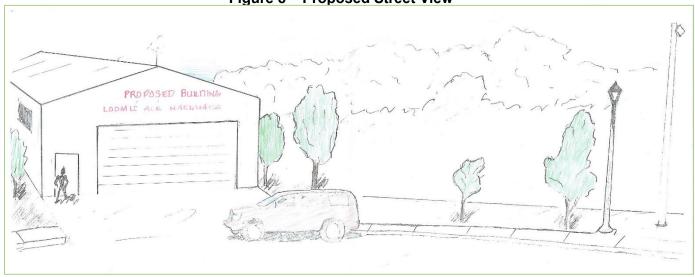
provides examples of the proposed structure. Note man door on front, fixed windows on the sides.
